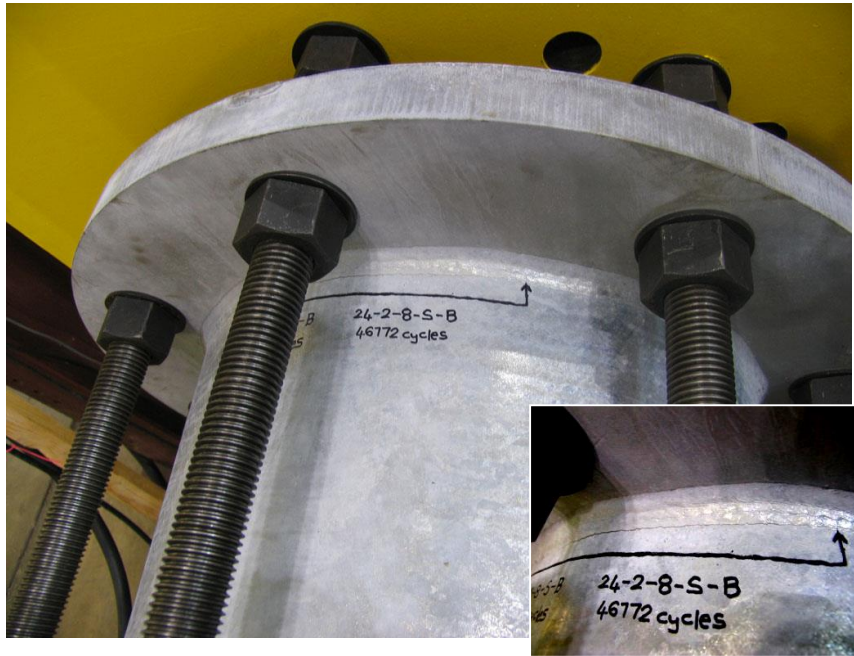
Typical failure of fillet welded socket connection (Rios, 2007)
